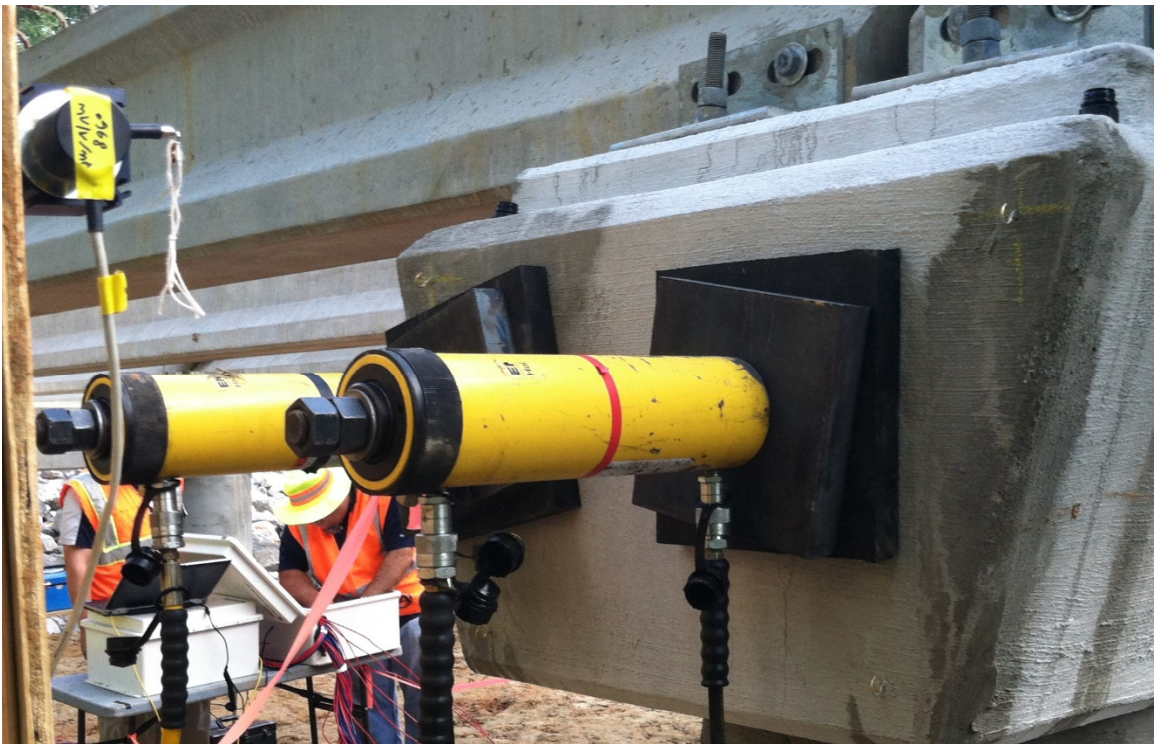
Hydraulic Jacks Bearing Against Steel and Elastomeric Bearing Pads on the Bent Cap
